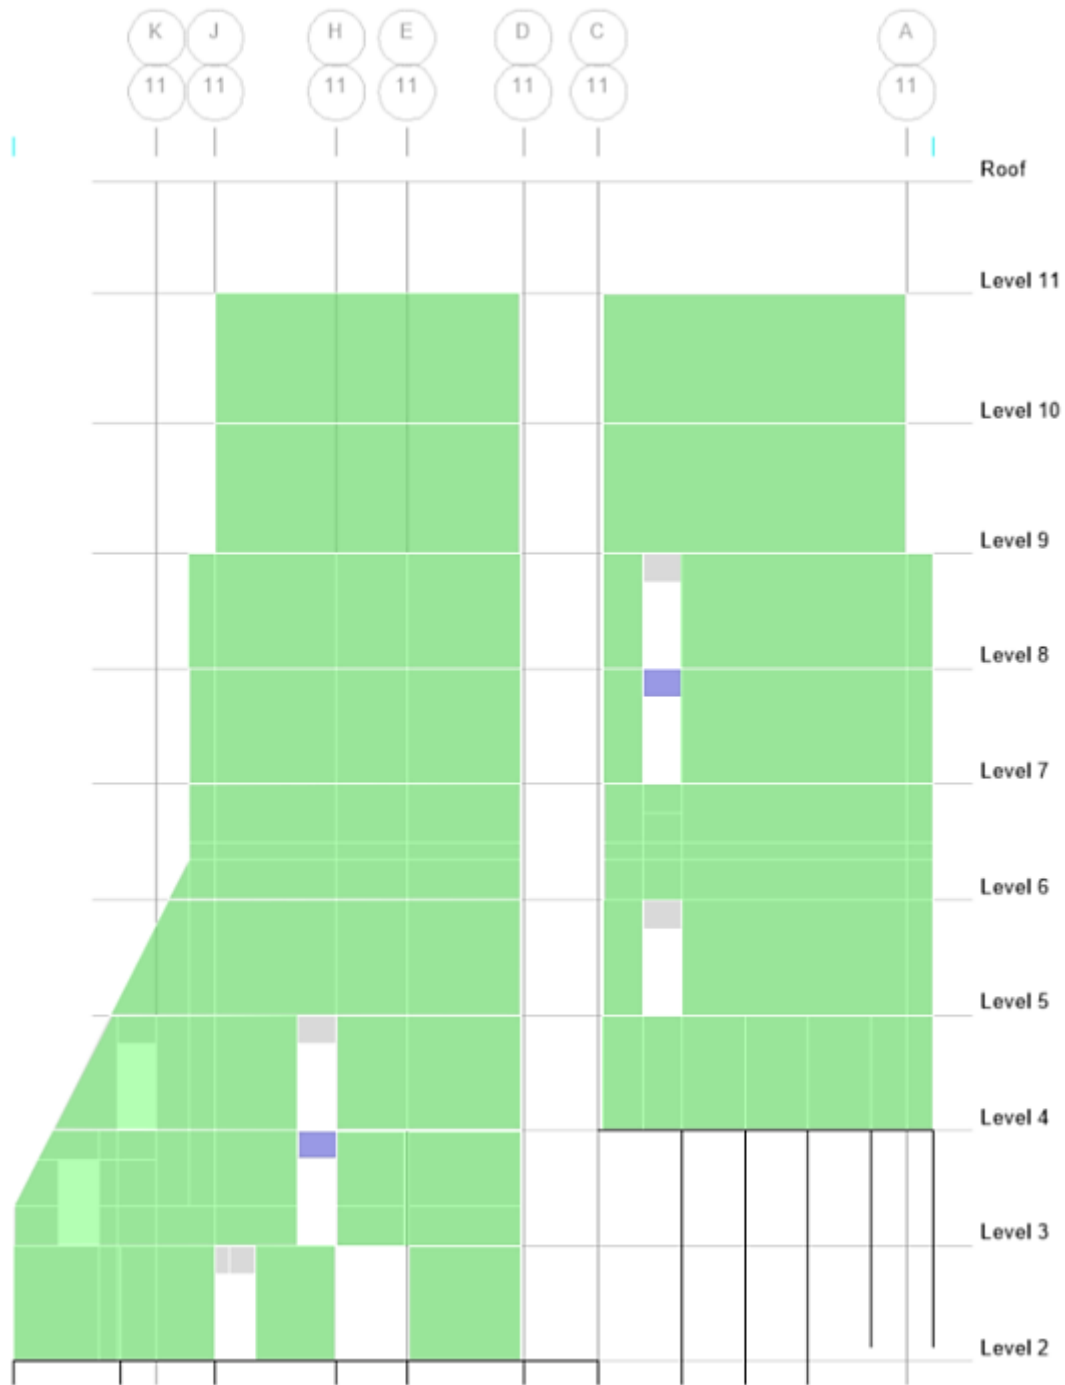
, Gridline 11 Transverse Direction Wall – South Structure
